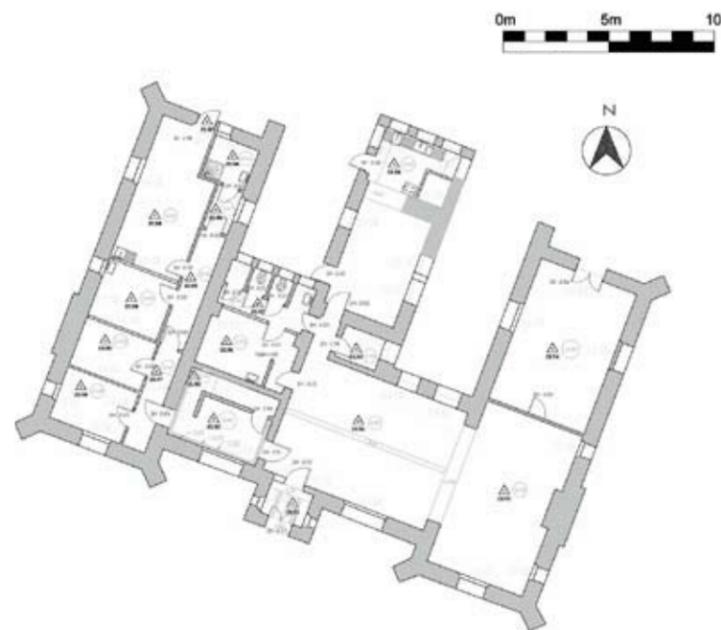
5 Ground floor plan of female infirmary as existing from Survey
